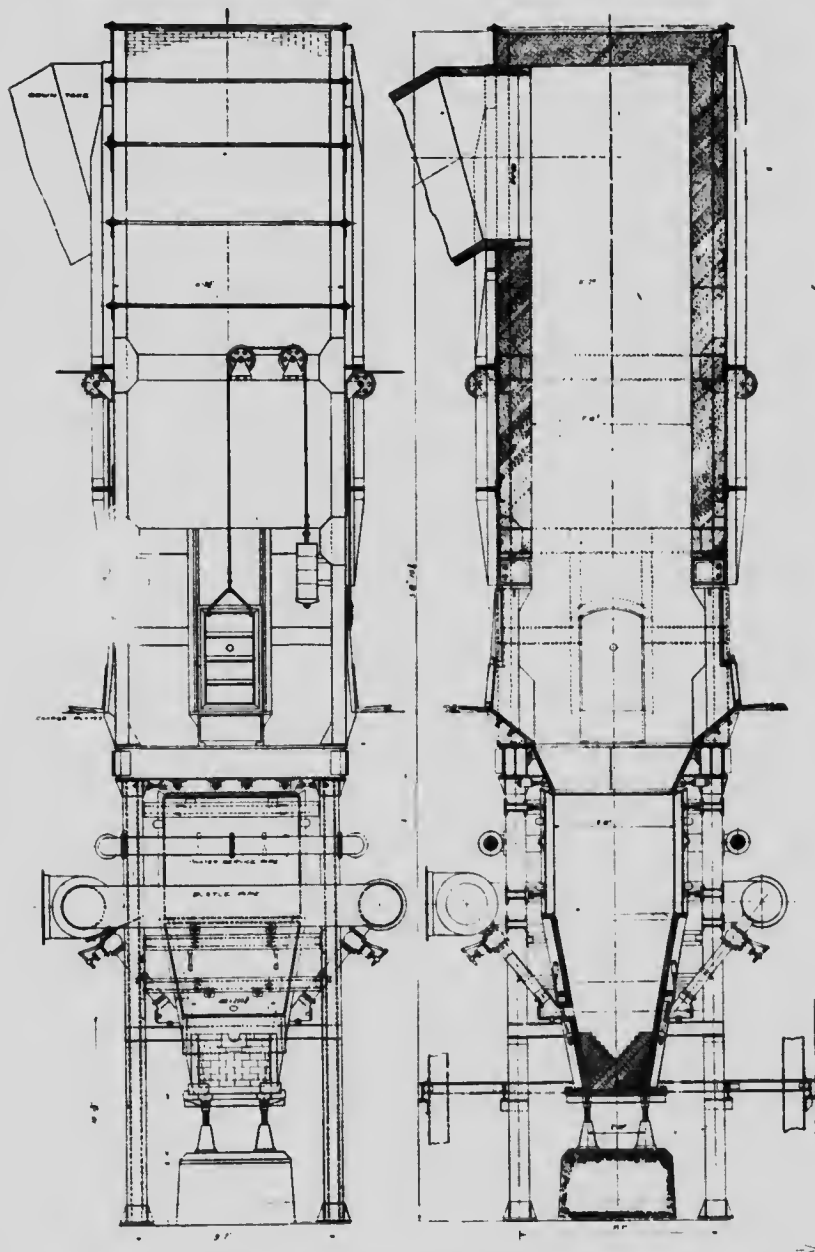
End elevation blast furnace No. 6. Figure 16.—Cross-section, blast furnace No. 6.
